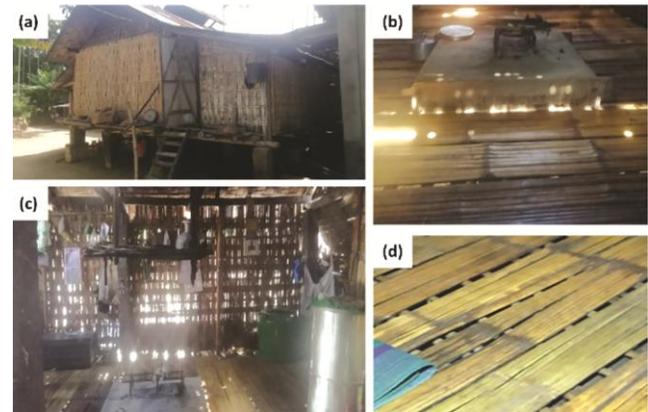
(a) Structure made of bamboo (b) fireplace used for cooking and heating (c) perforated bamboo walls (d) bamboo flooring
